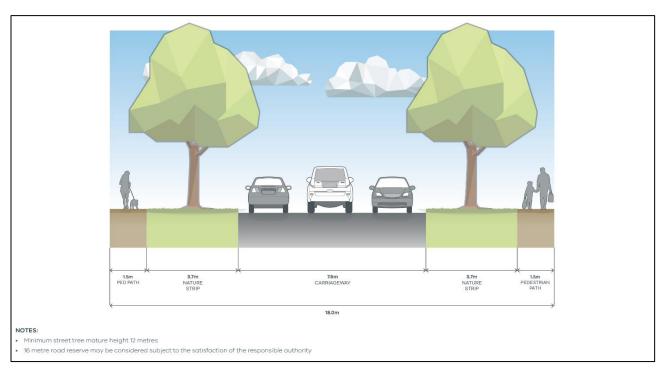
Local access street cross section - 18m (Source: VPA)
